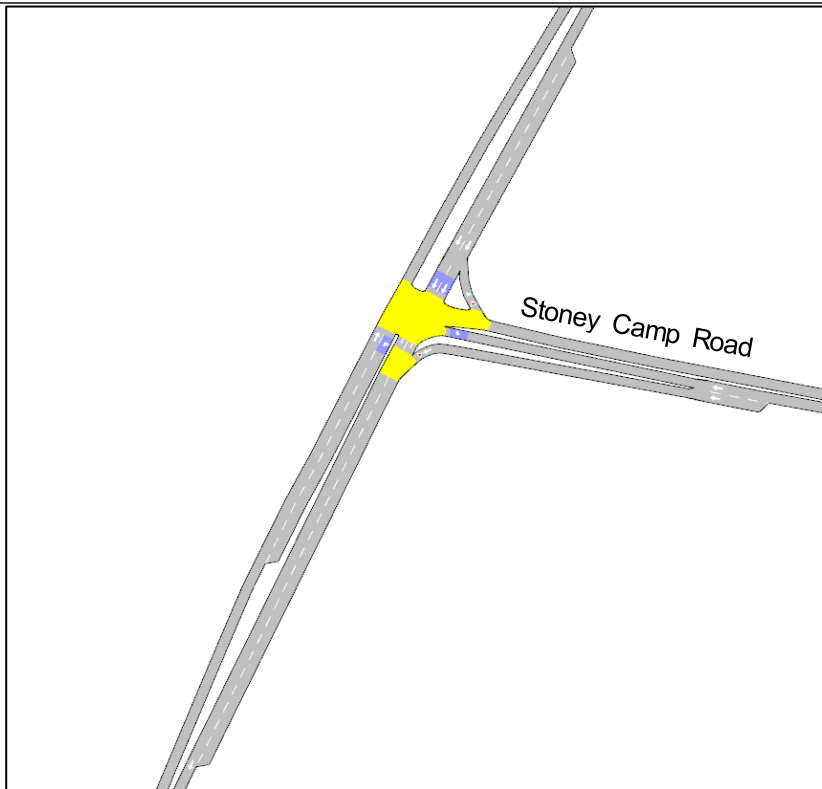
2031 Stoney Camp Road / Teviot Road Improvements
